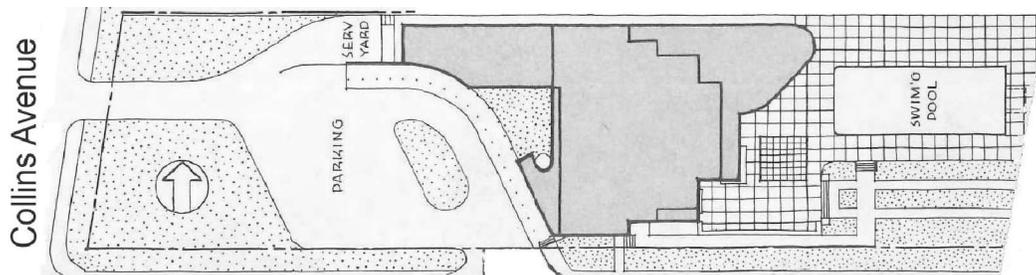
Site Plan, Shelborne Hotel, 1801 Collins Avenue, 1941. (Architectural Record)
